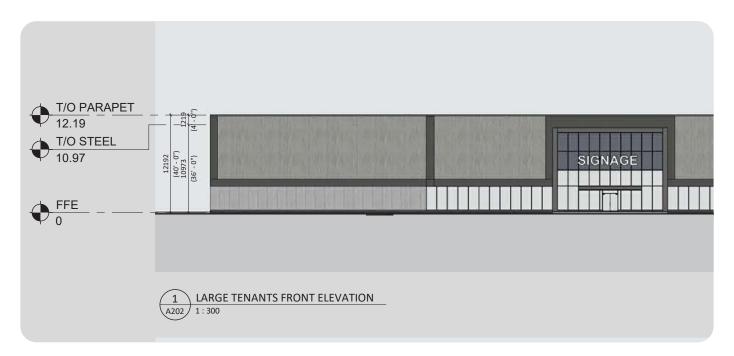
Proposed preliminary building elevation. Courtesy of Turner Fleischer Architects Inc.
